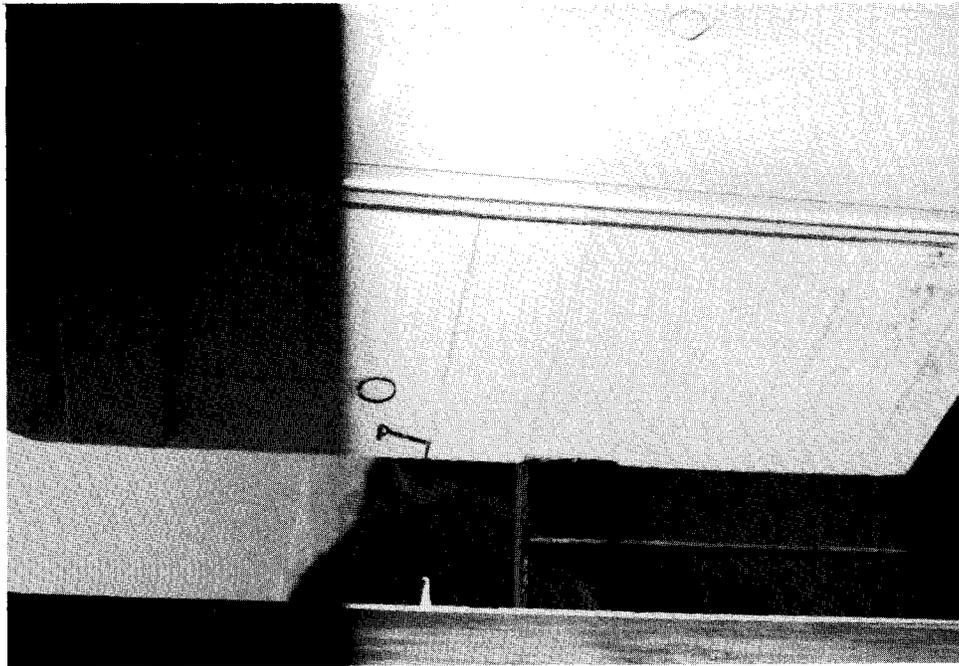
Room 112, outer door in exterior doorway from Watch Deck to Watch Gallery.
